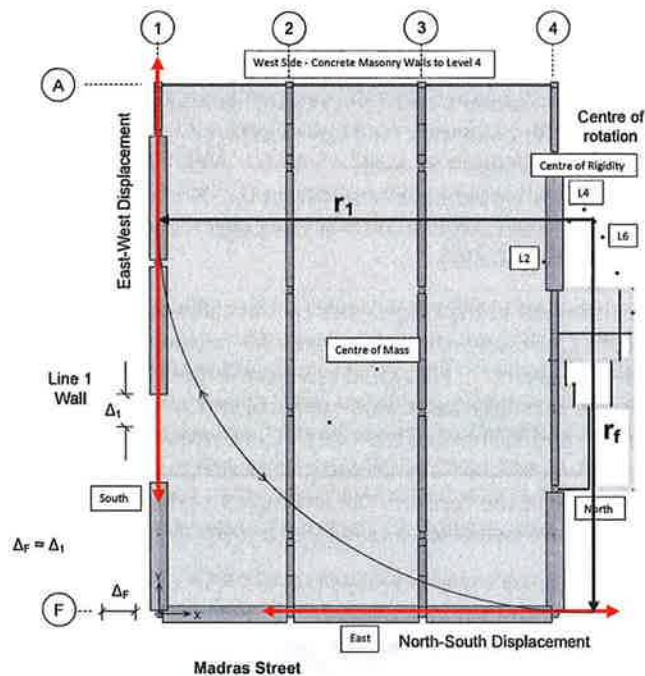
Torsional behaviour of the building increased due to the effect of the masonry infill wall on Line A. This shows that the building had a tendency to twist about the centre of rigidity that was moved towards the Line A wall because of its stiffness. The centre of rigidity was furthest west at Level 4. This resulted in the columns along Line I and F experiencing similar and the highest levels of inter-storey drift as the building responded to the Earthquake and Aftershock. This made the columns on these lines the most susceptible to being damaged and initiating collapse during the Aftershock. Line I is thought to have had more protection against progressive collapse occurring due to some of the beams also being supported off the South Wall which was observed to have collapsed after the rest of the building.
